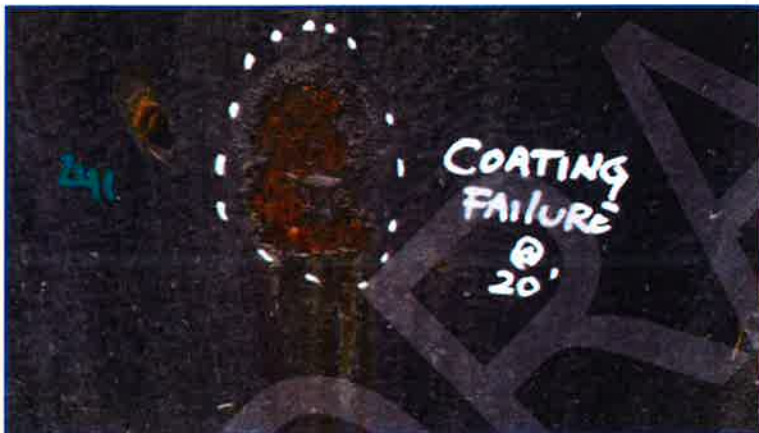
Coating failures present the East shell wall of the wastewater tank at 20' from the North end.
